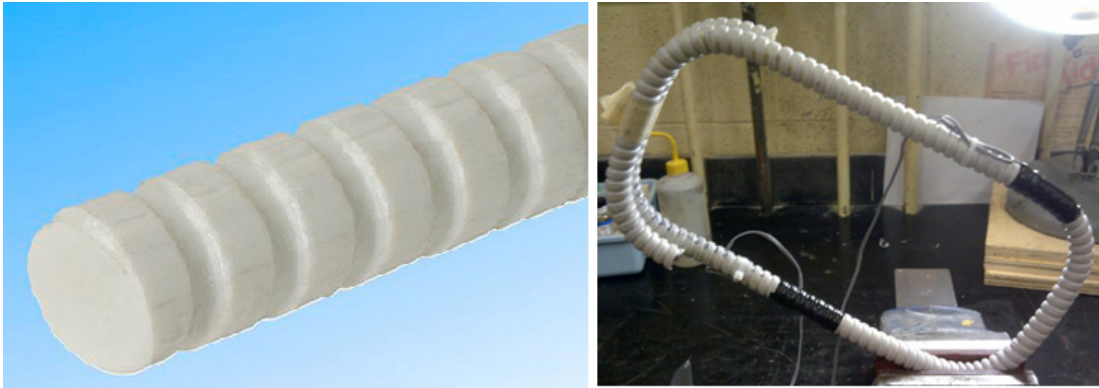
Reinforcement used in Testing: (a) Longitudinal GFRP Bar; (b) GFRP Stirrup
